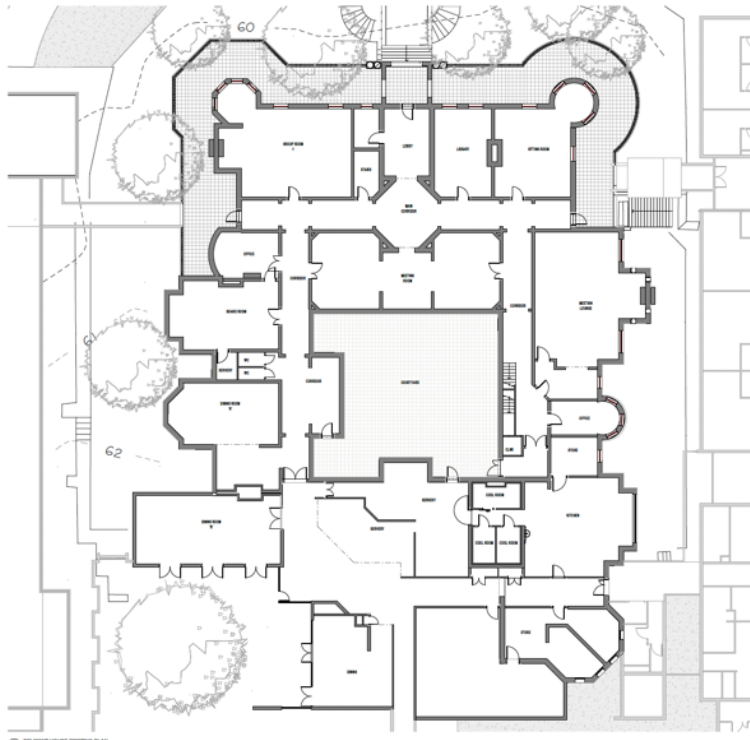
EXISTING GROUND FLOOR PLAN. St John of God Richmond Hospital.
